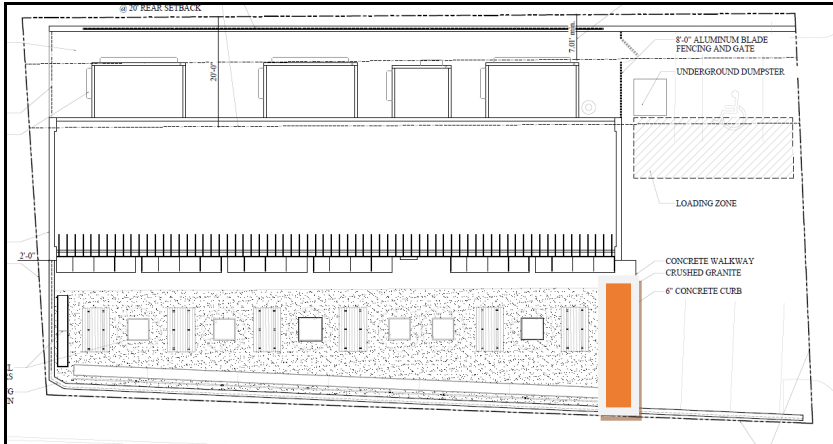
The highlighted area is recommended for a stair to connect to the sidewalk as it is the area of lowest grade that will not interfere with the proposed parking area or green wall.
